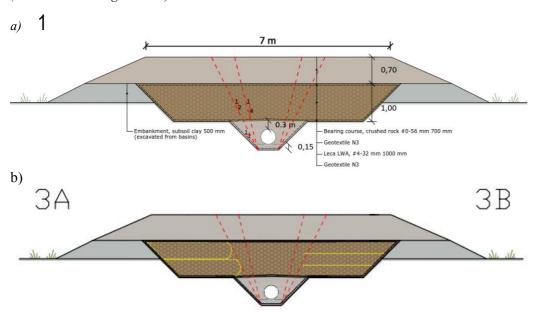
Schematic cross-section of the test structure 1 (a), 3A and 3B (b), 3A=geotextile wrap-around and 3B=geotextile multi-layers). Red lines determine the excavation slope tolerances (2:1 and 4:1)
